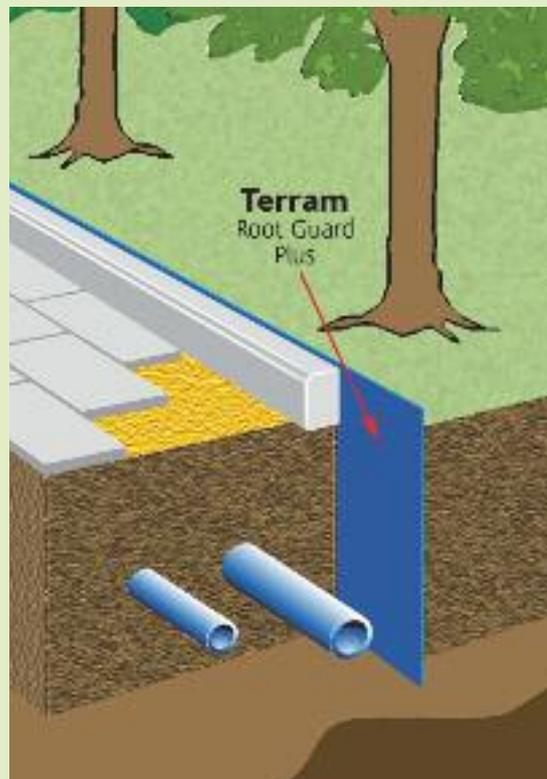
Terram Root Guard Plus installed as a vertical barrier can protect pavements, underground services, walls and foundations.
